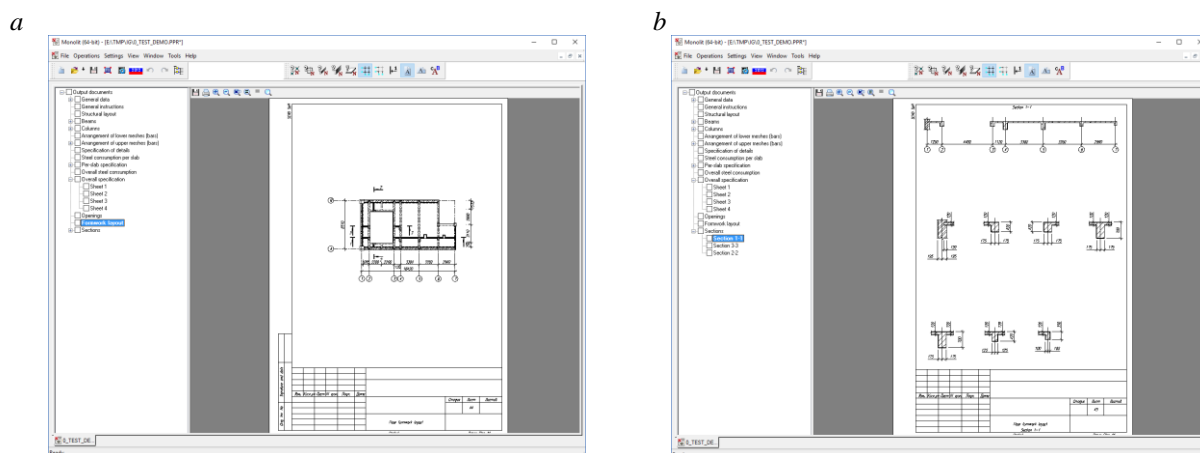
Formwork layout (a) and sections (b)
